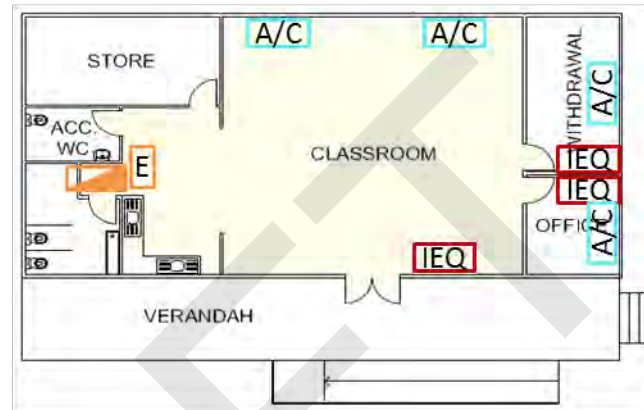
B08 - High school – years 9 to 10 first floor east -- monitoring layout
